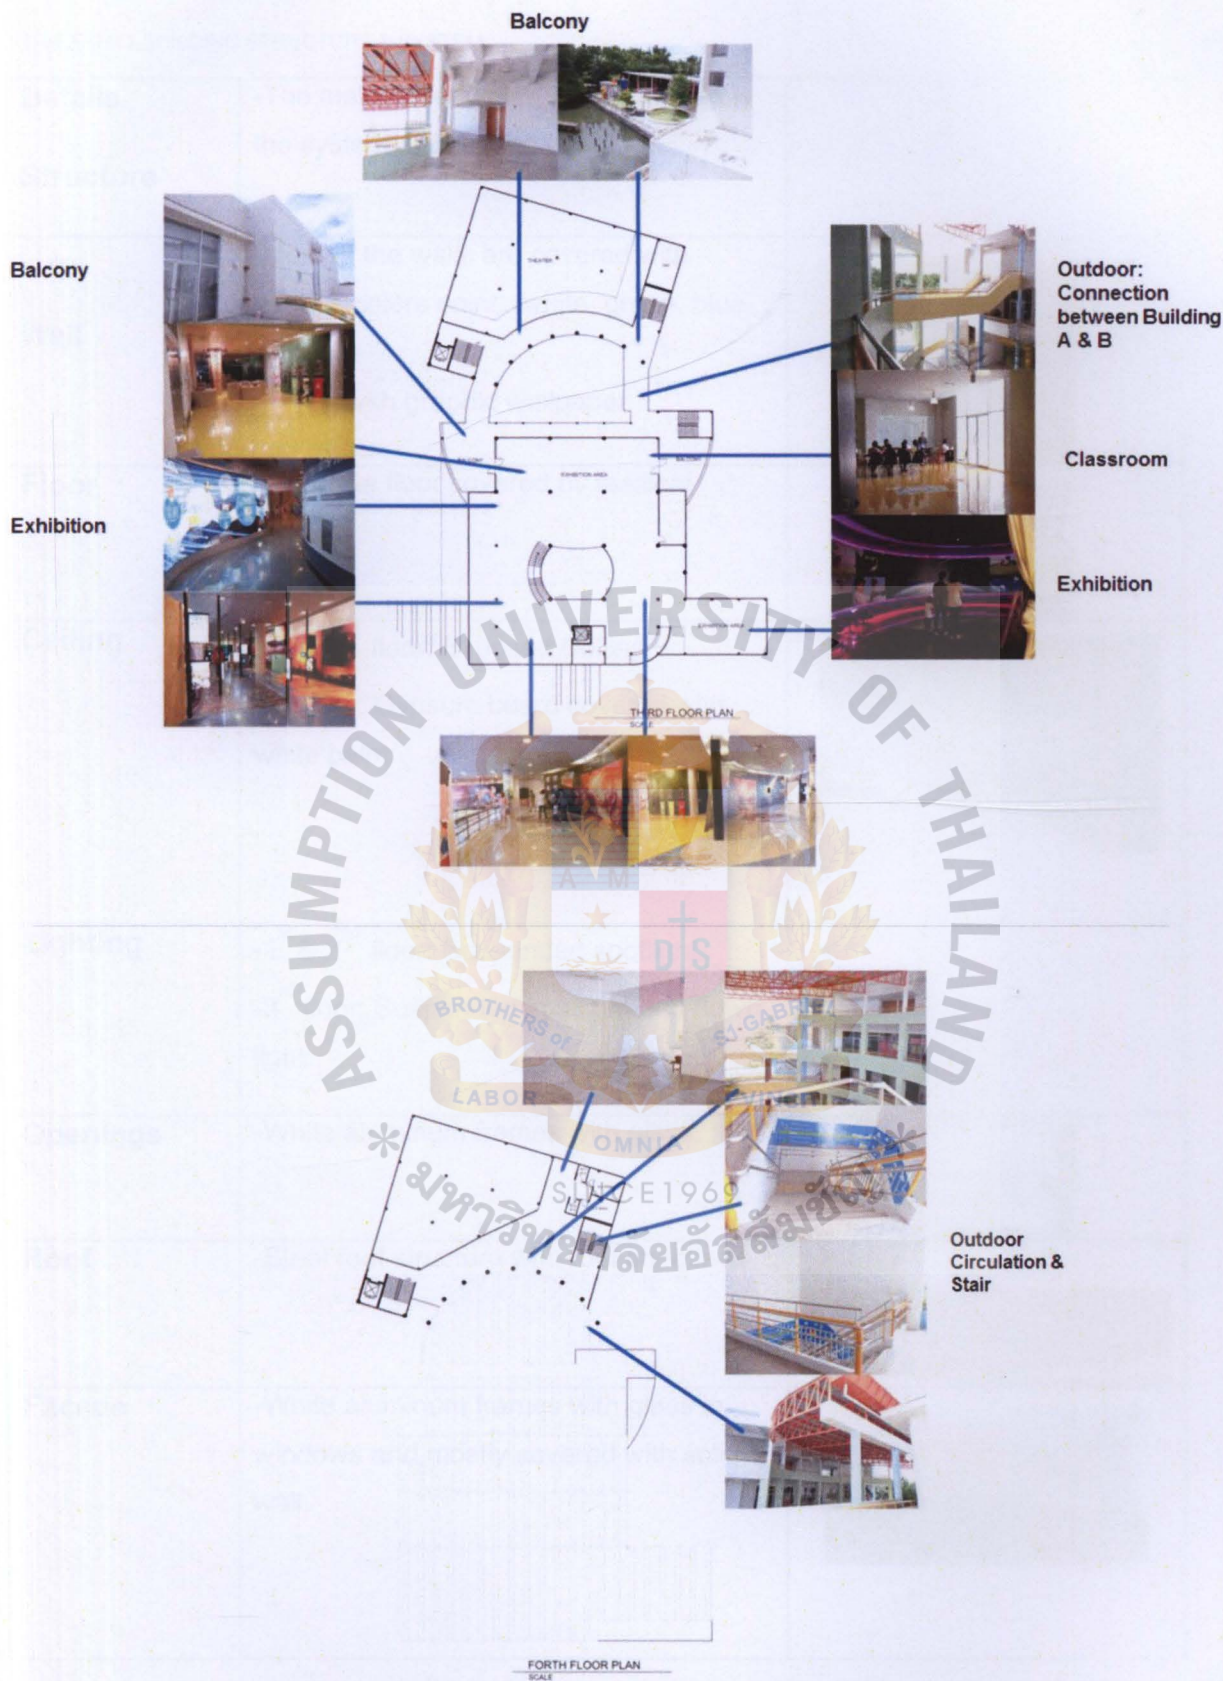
EXISTING BUILDING THIRD & FORTH FLOOR
